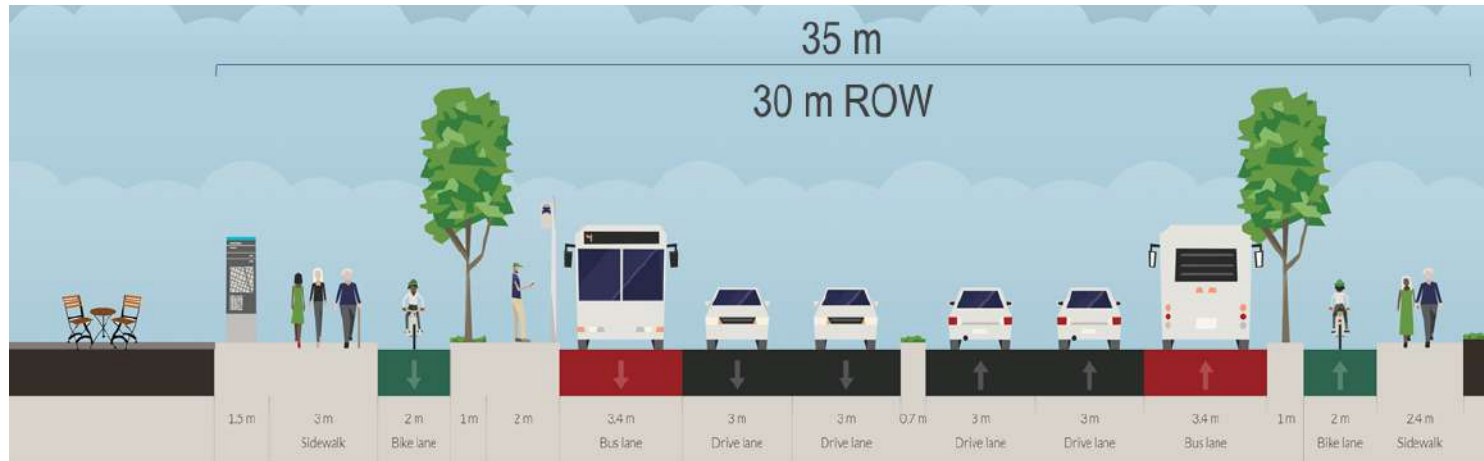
Cross-section of Carling Avenue at the Lincoln Fields Station
